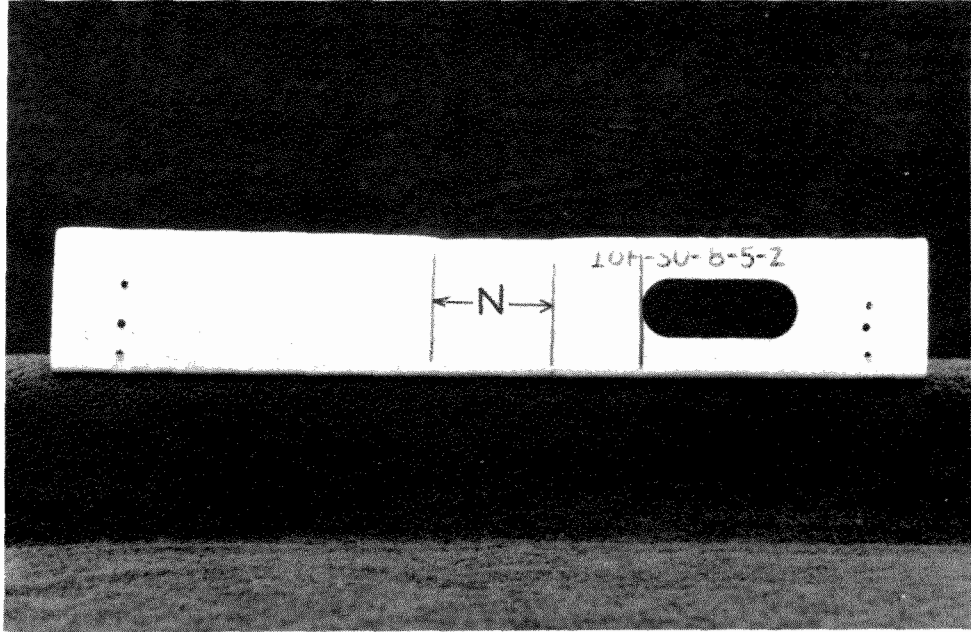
Typical Unreinforced IOF Web Crippling Failure, IOF-SU-8-5-2
